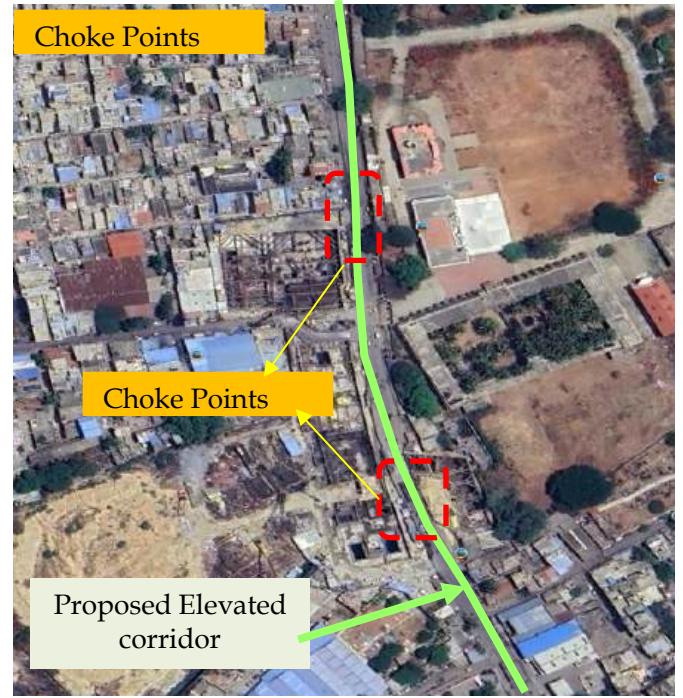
Proposed elevated corridor from MM road to Nagawar junction
